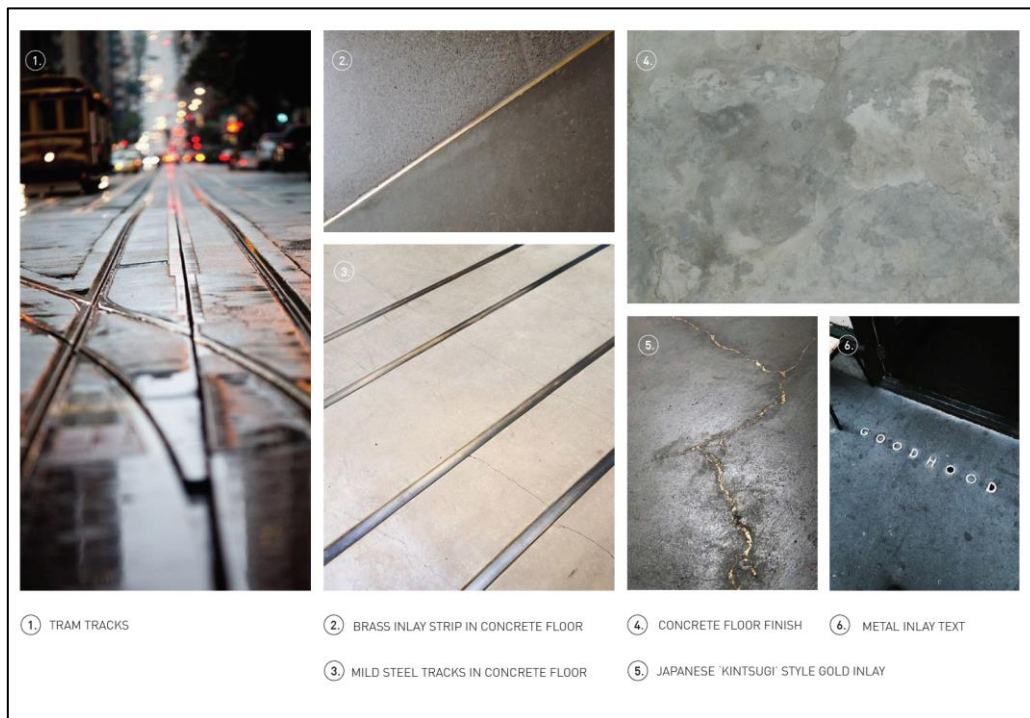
Image of inlay styles proposed for the central corridor. (Source: Sissons, Buchans, Curio. 2019)
